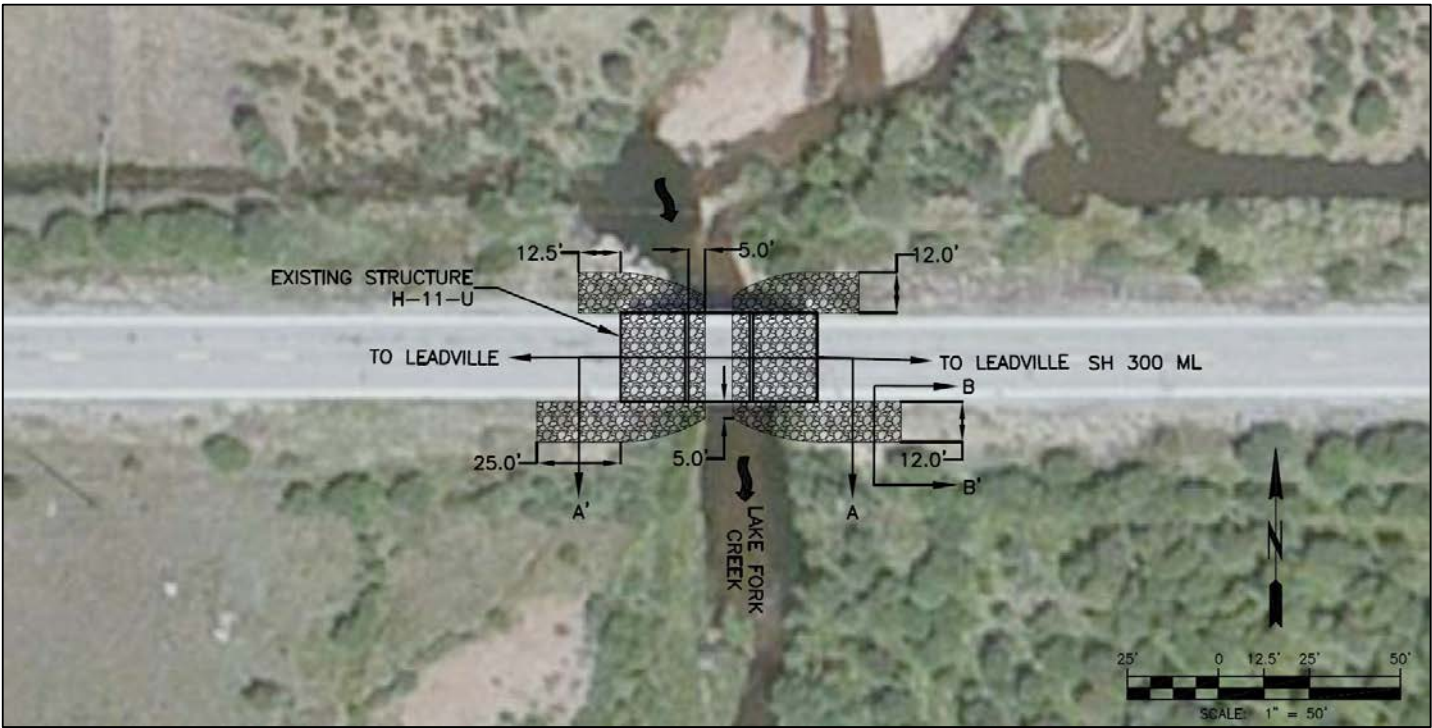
Plan view of Bridge H-11-U with recommended hydraulic scour countermeasure locations
